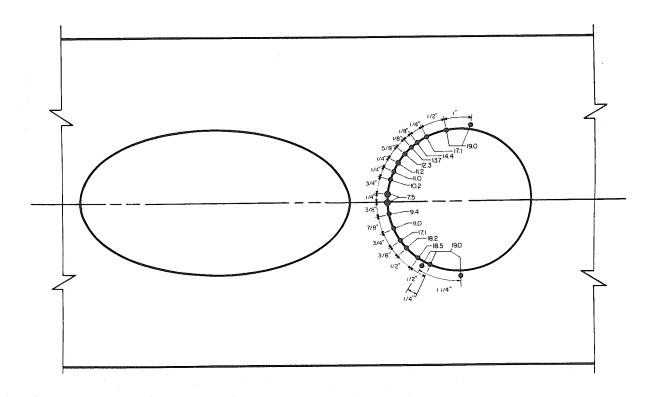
JOINT TYPE I - SPECIMEN No. 3 DETAILED CRACK PROPAGATION IN COLUMN MEMBER WALL
